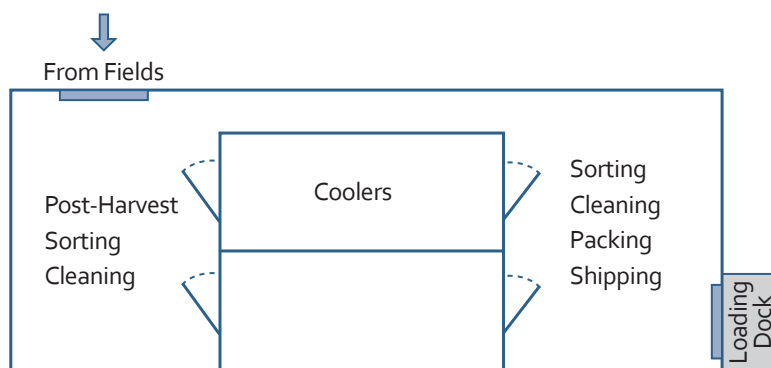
Example floor plan of a storage facility with a post-harvest processing area, coolers, packaging area, and loading dock in series to facilitate high-volume throughput.
